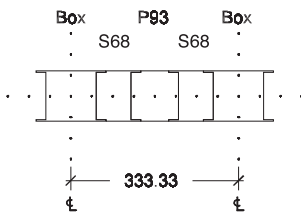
Typical Wall Adjustment using Spacer 68/Panel 93/Spacer 68
